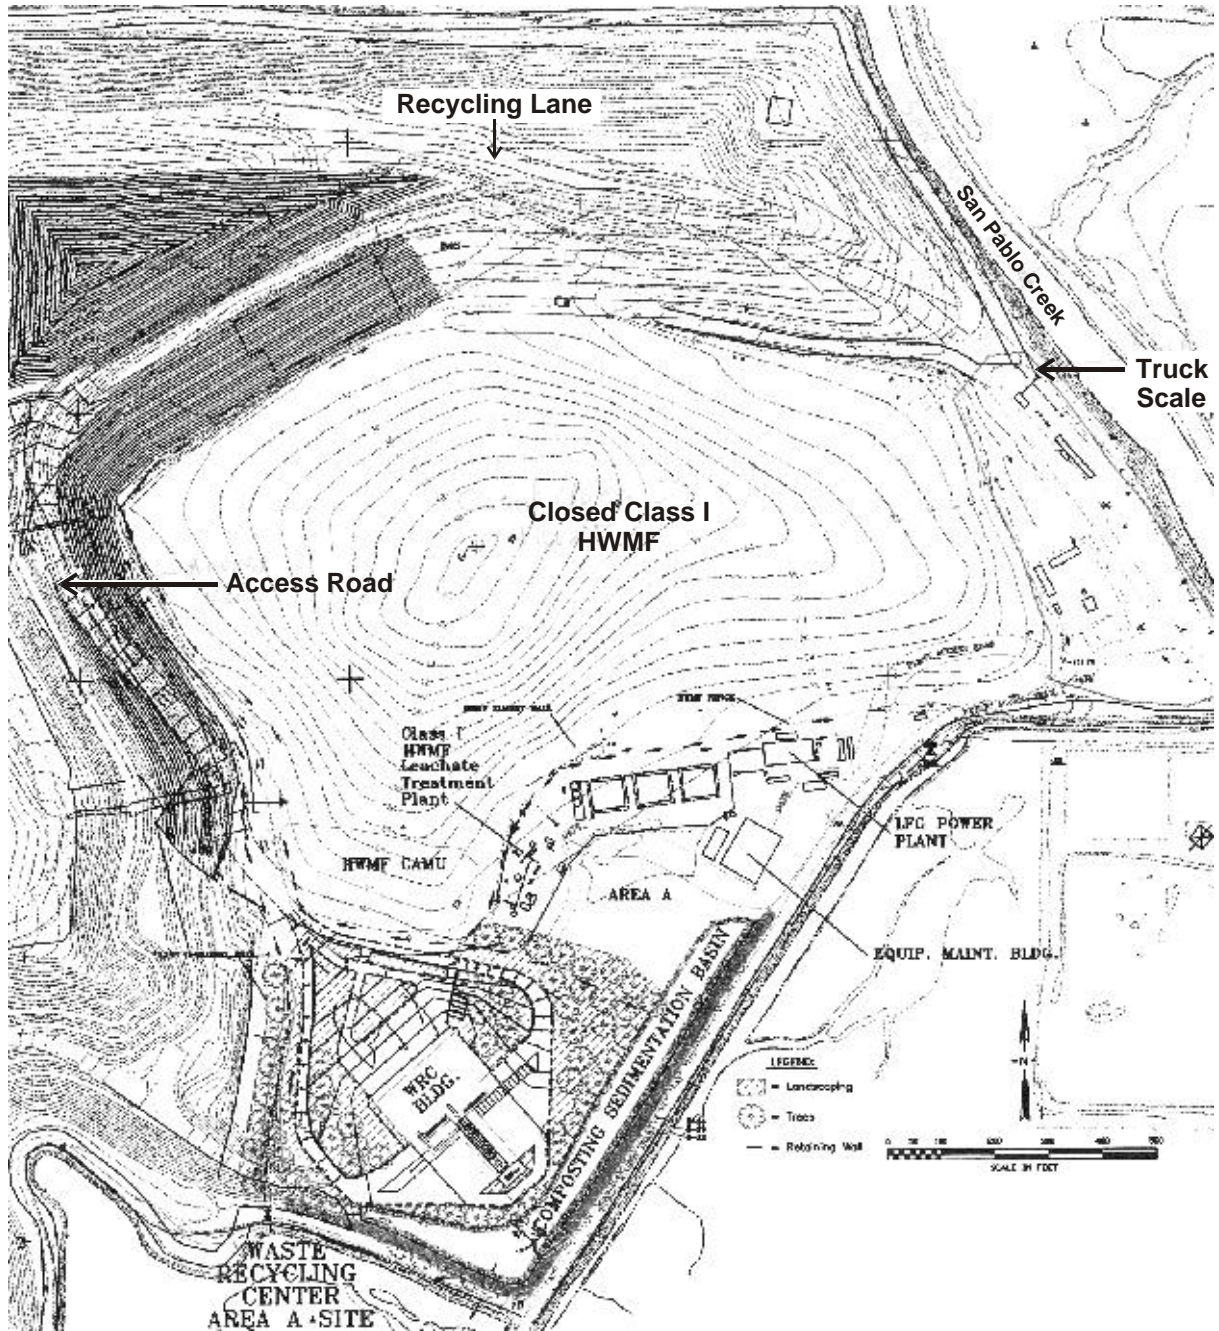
A-1 Grading Plan and Surface Drainage Plan Area A Site
